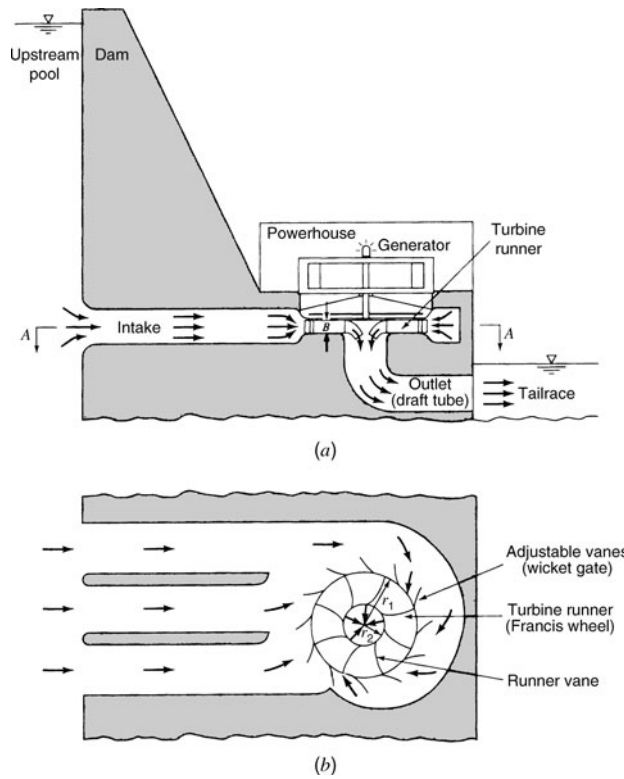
Schematic view of reaction-turbine installation. (a) Elevation view; (b) Plan view—section A–A (from Roberson et al. (1998)).
